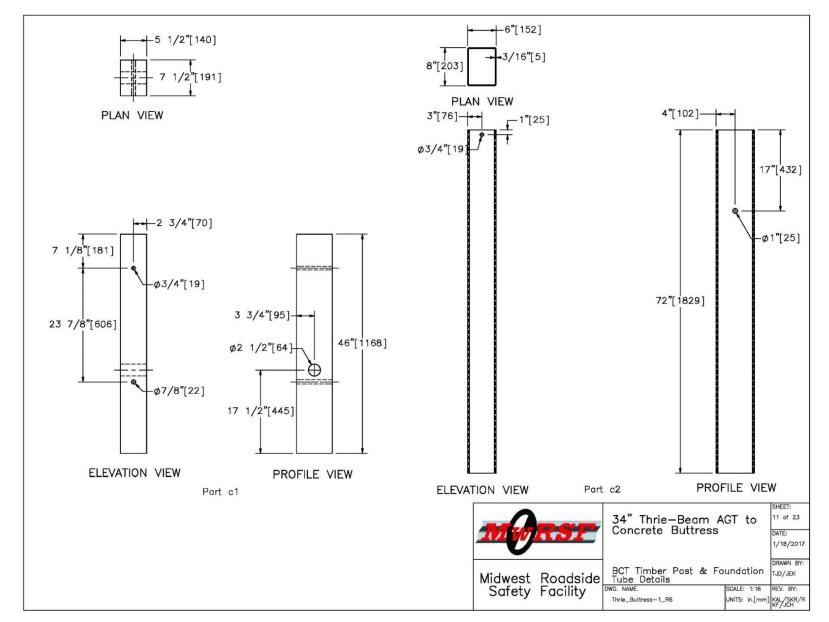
BCT Timber Post & Foundation Tube Details, Test Nos. 34AGT-1 and 34AGT-2
